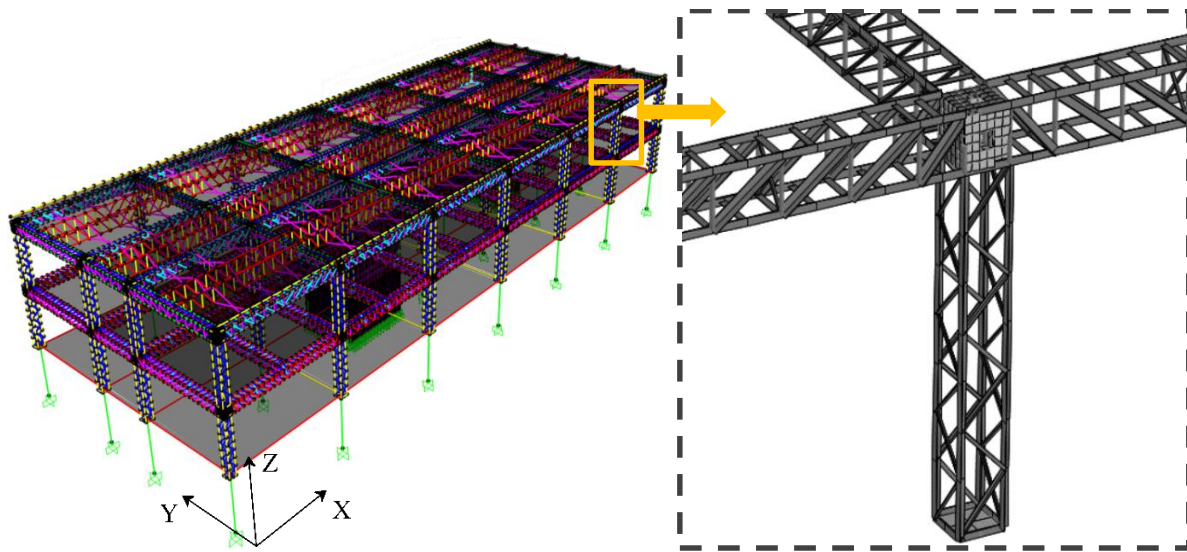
View of the CM finite element model of the structure and detail of a steel beam-to-column joint
